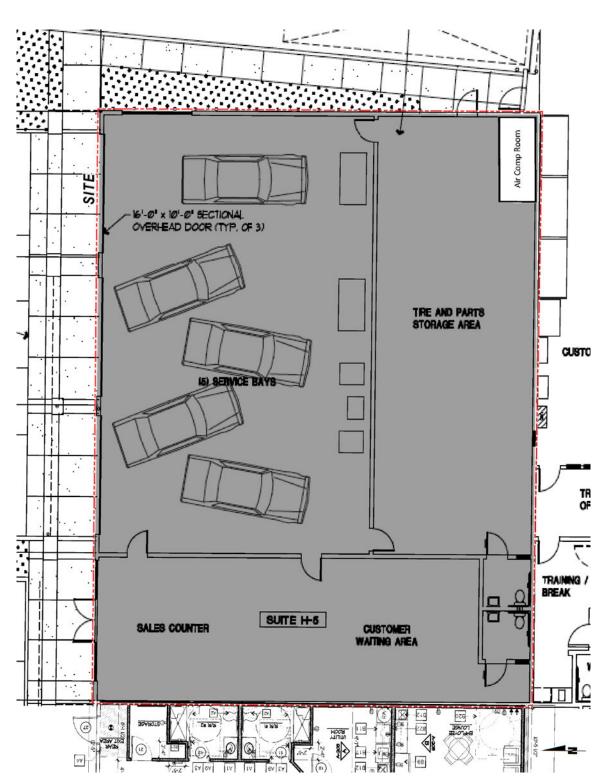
C: DISCOUNT TIRE CENTER SITE PLAN
